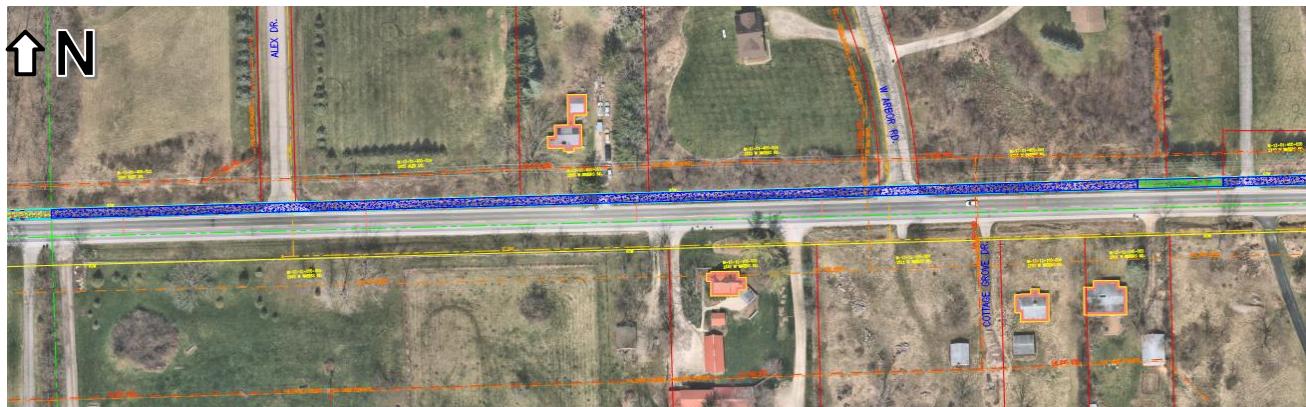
The proposed path on Waters Road, crossing Alex Drive, West Arbor Road, and showing a creek crossing requiring about 100 feet of boardwalk (green).
